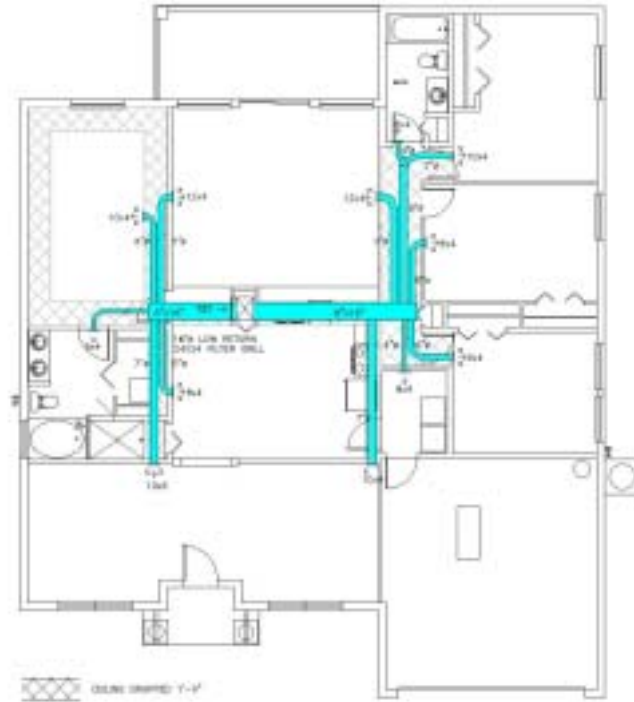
Plan of second prototype home showing central air handler with boxed-in ductwork across the main living space
